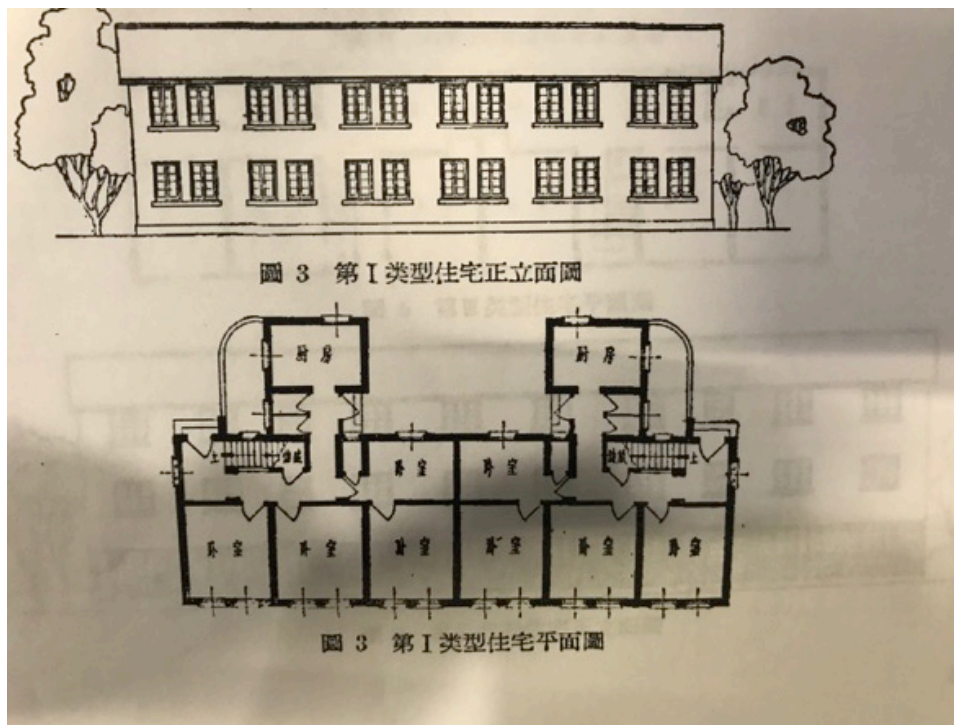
Blueprint of apartments built in Caoyang Workers' New Village in 1951. The image shows the first floor of two six-household units divided by a center barrier. (source: Wang, 1956)
